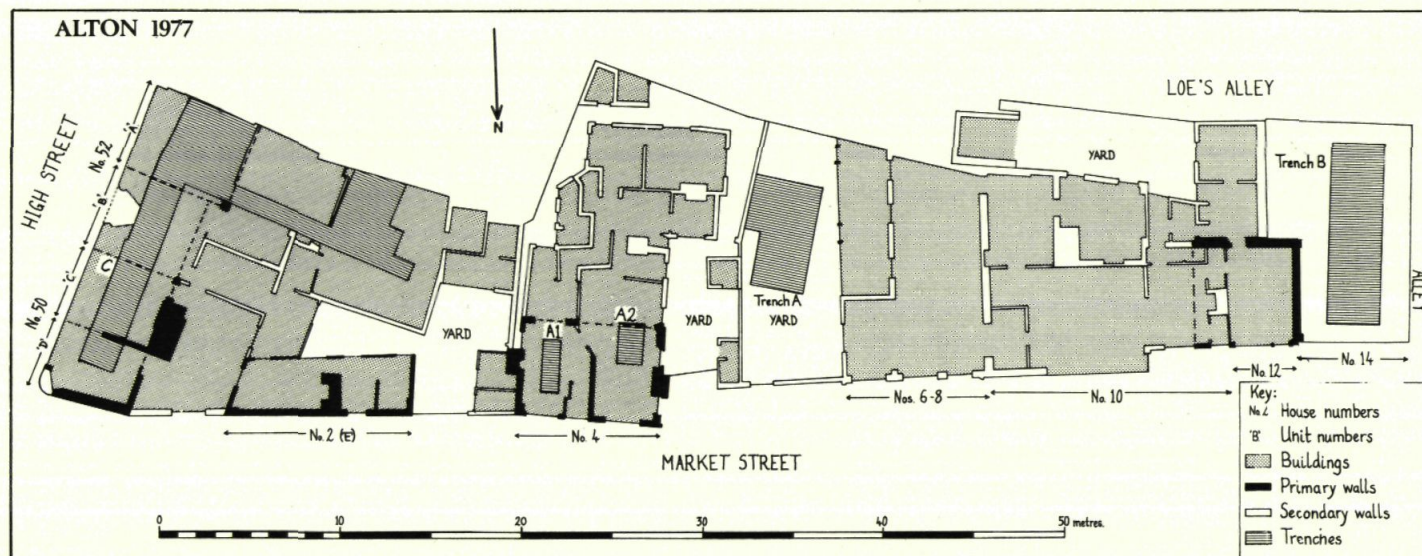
Plan of Johnson's Corner showing the buildings as standing in 1977, and the trenches excavated.
